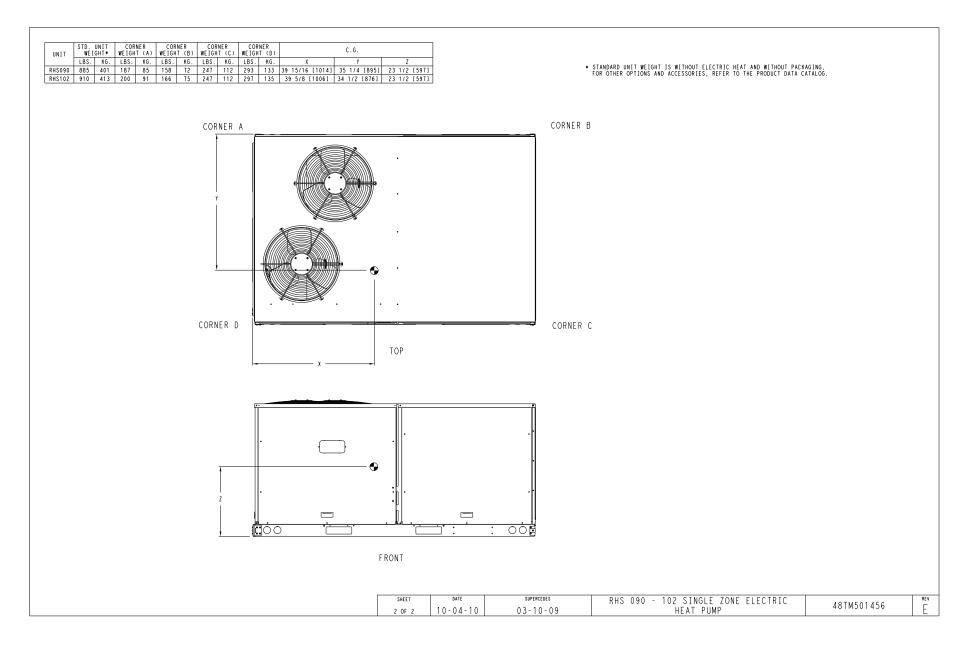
Unit Dimensional Drawing – 090 and 102 Size Units (cont)
